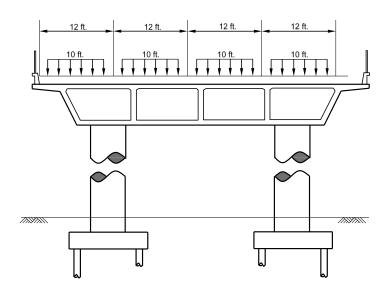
HL-93 Lane Loads Positioned Transversely
